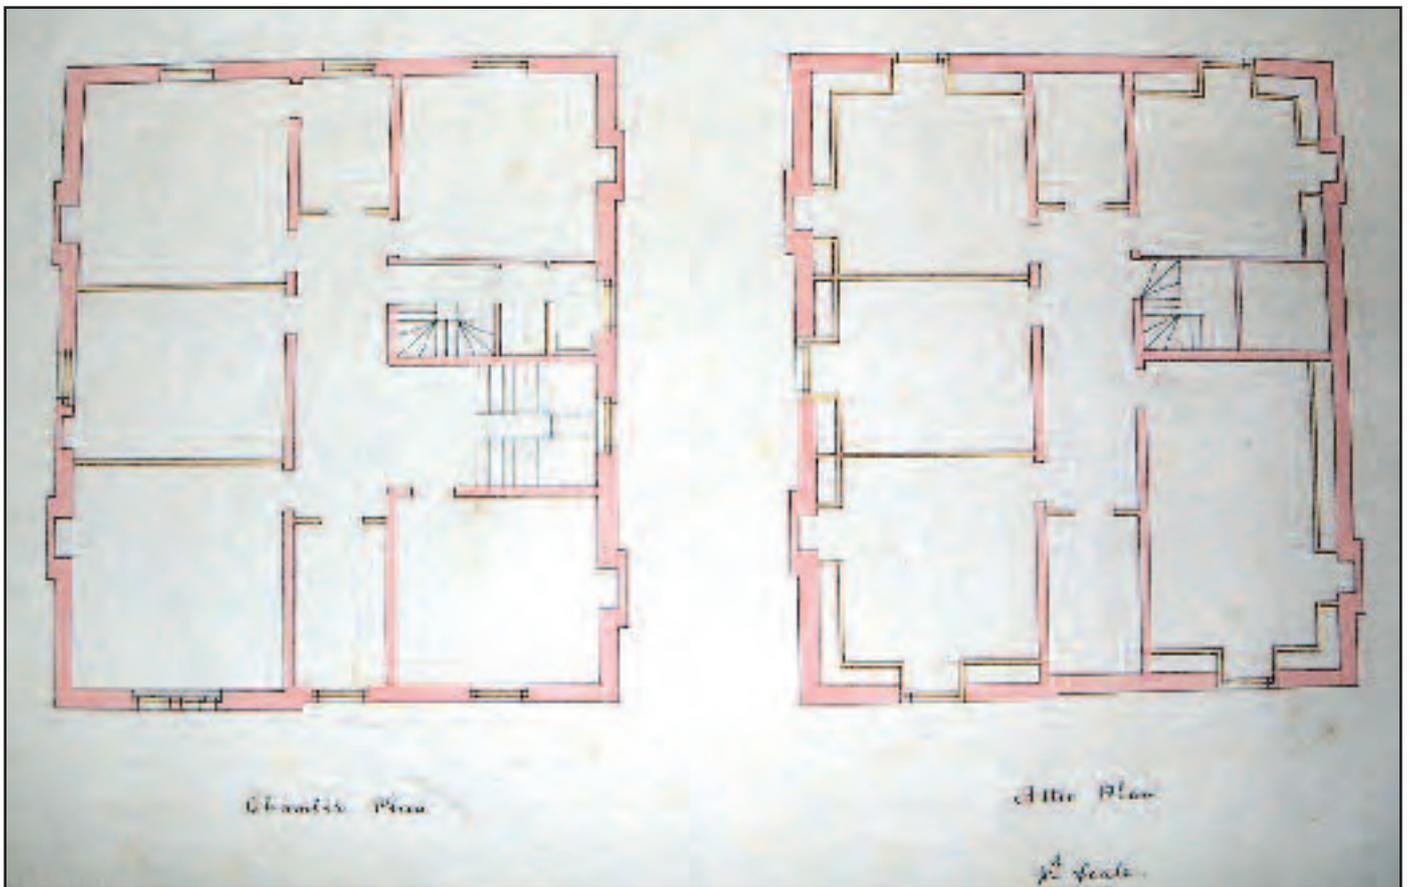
First floor and attic plans of 9-11 Priory Road, 1872
